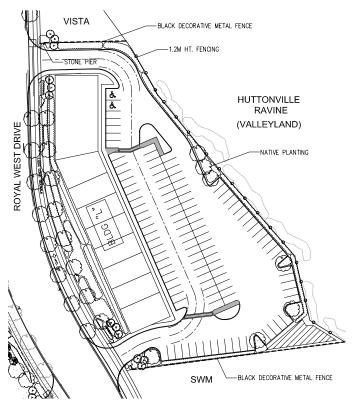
Commercial / Open Space interface - Typical plan
